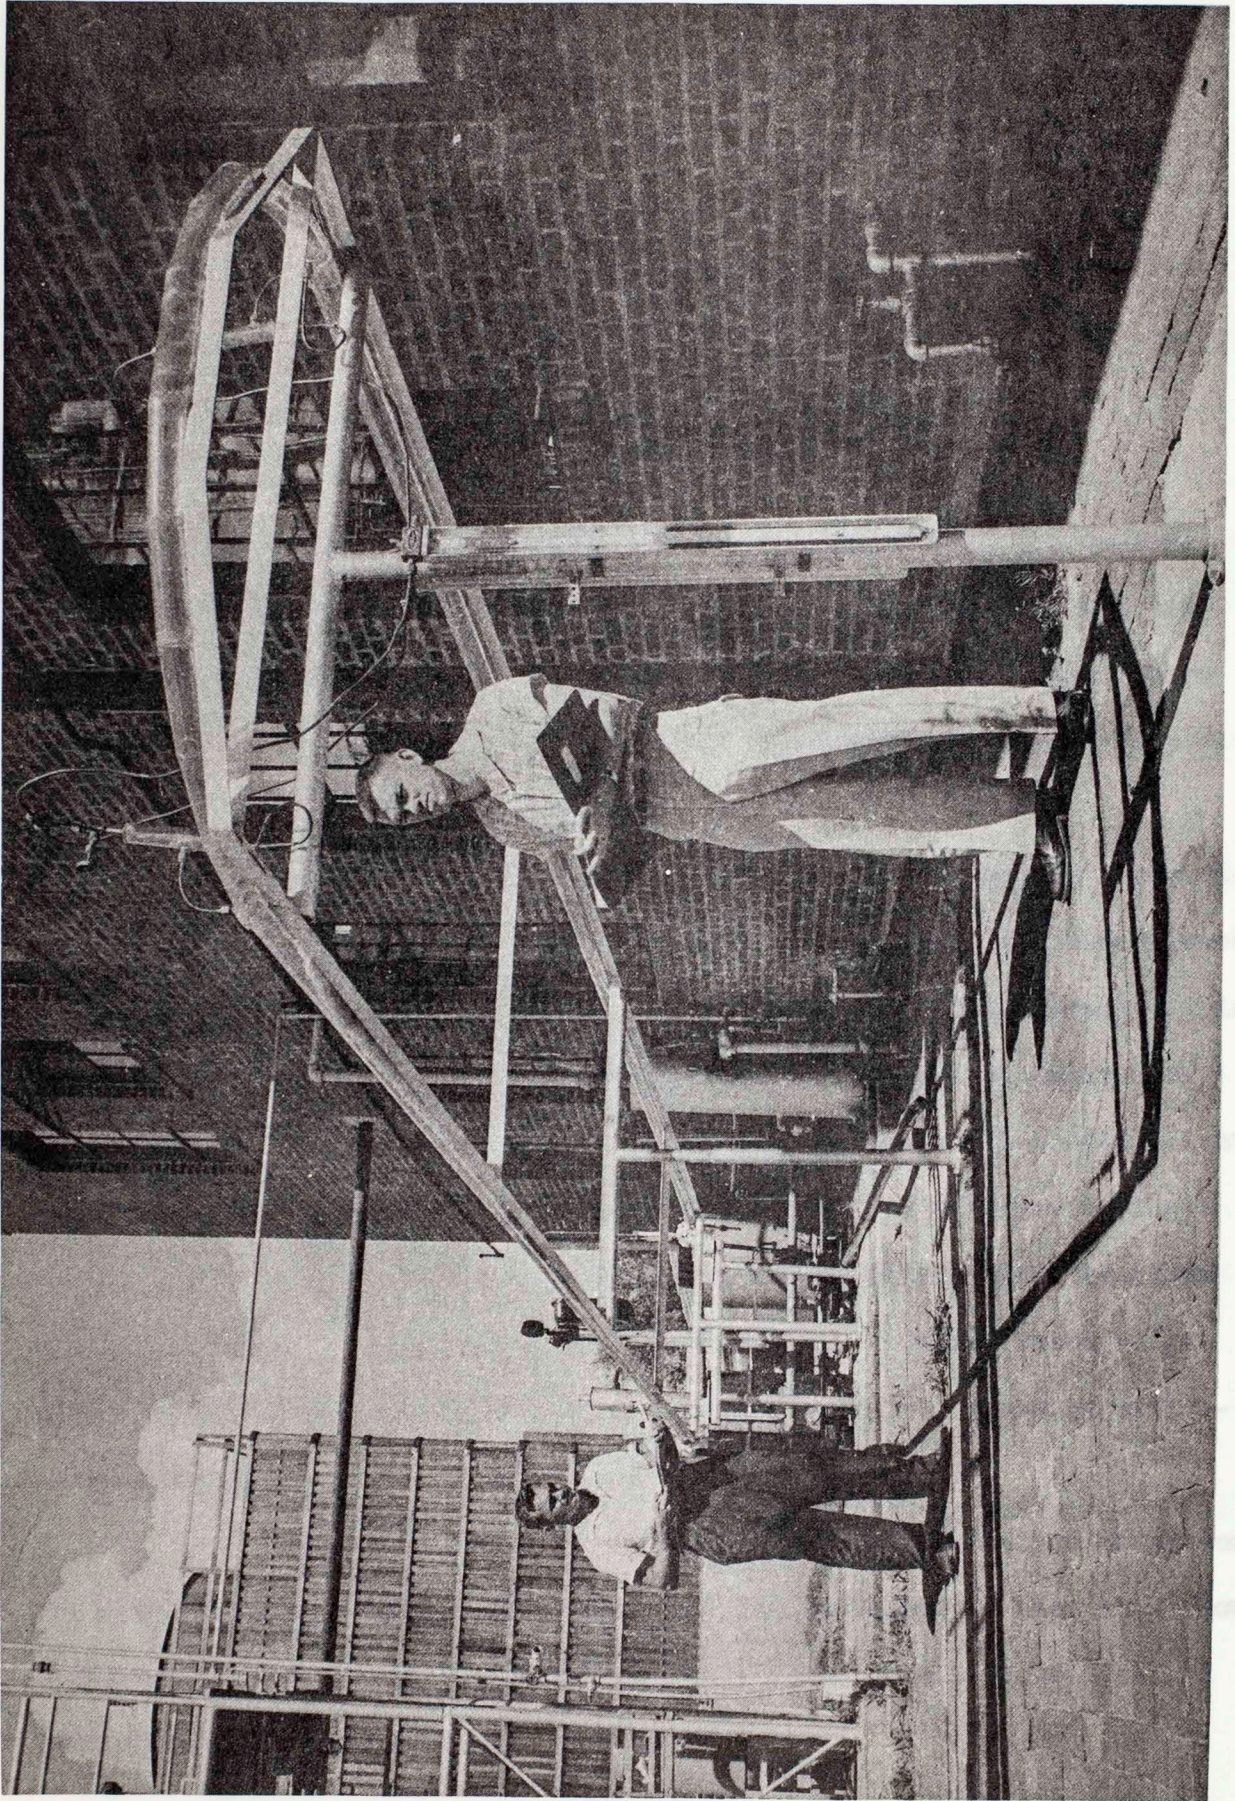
PHOTOGRAPH OF TEST SECTION
